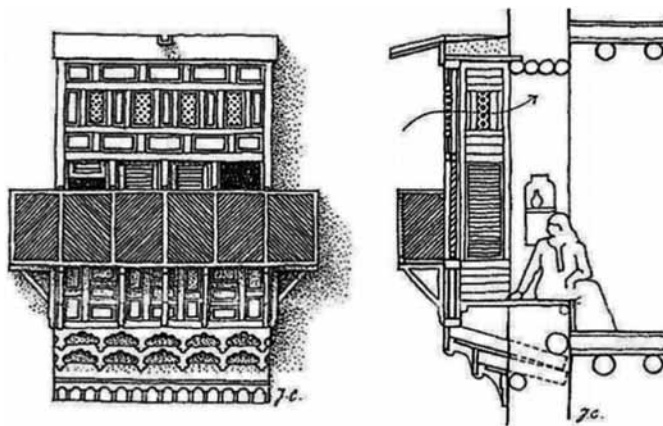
Details of Mashrabiya in elevation and section view (F. Ragette)
